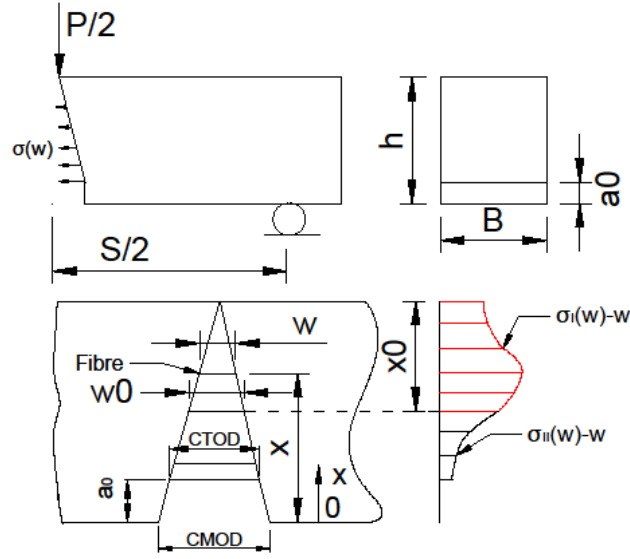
Crack reaching top in SFRC beam under three-point bend
